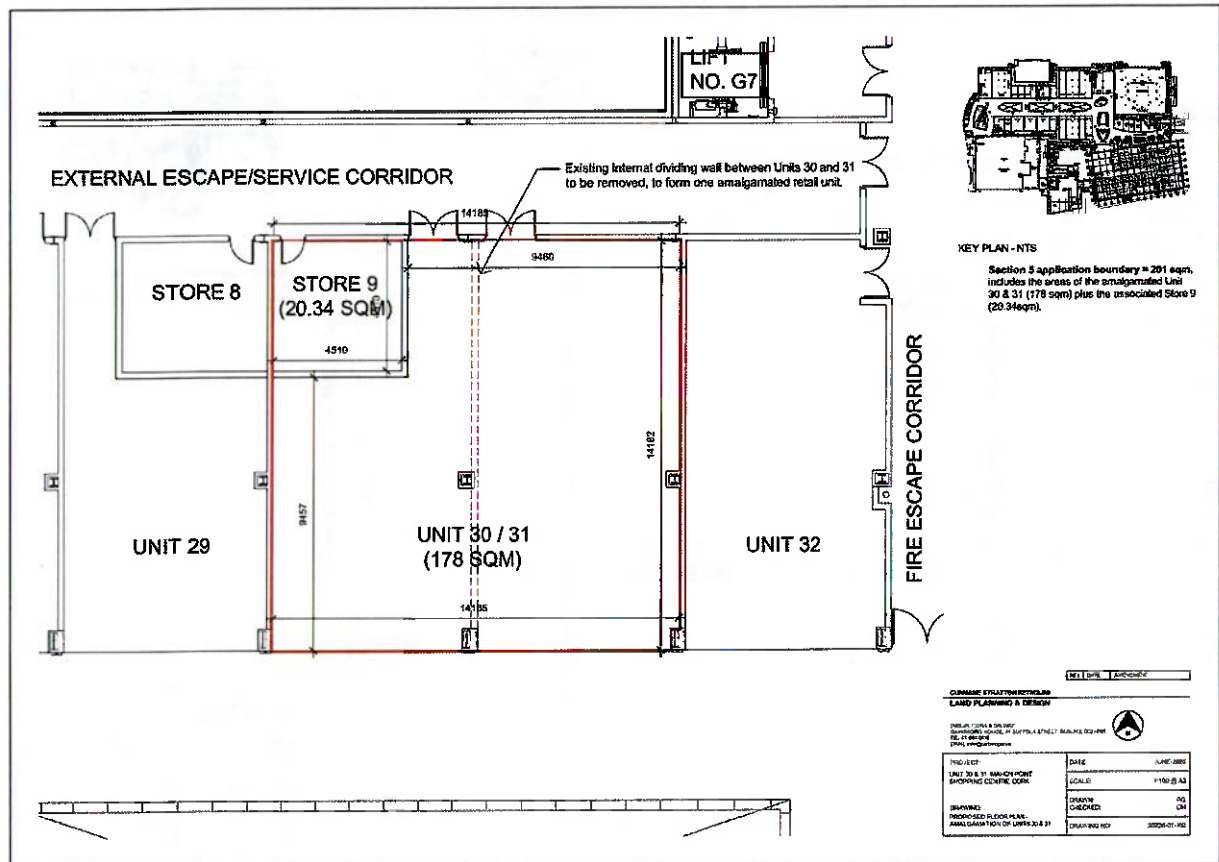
Extract from CSR Drawing No. 26226-01-102 – Proposed Floor Plan, Proposed Amalgamation of Units 30 and 31, Mahon Point Shopping Centre.
